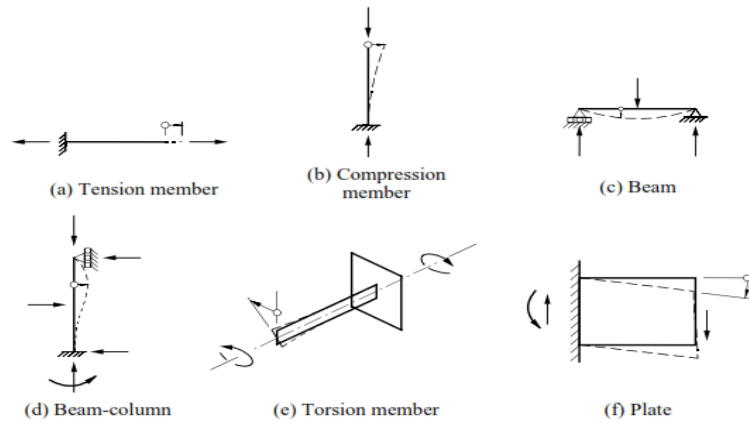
Load transmission by structural members [Trahair et al 2008].
